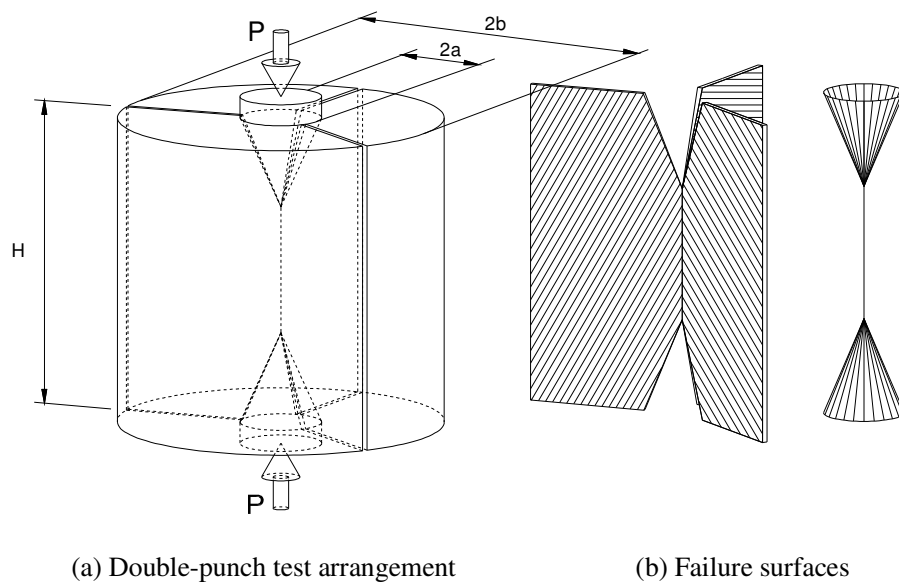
Double-punch test arrangement, mechanism of failure and failure surfaces.
